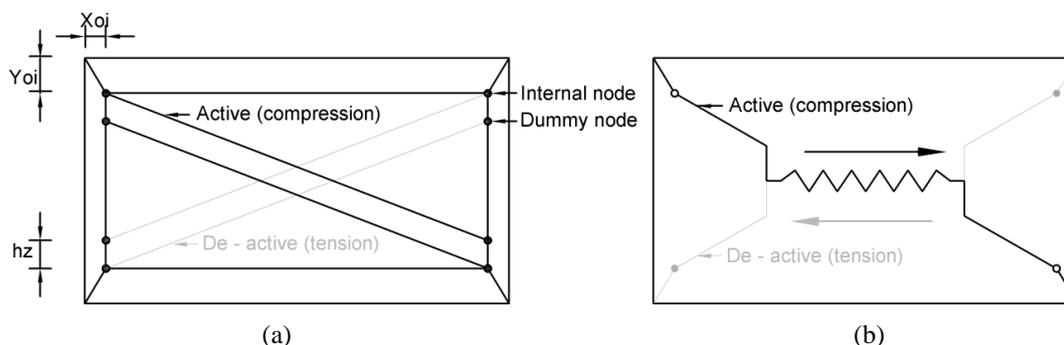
Infill panel element proposed by Crisafulli (1997) (a) Compression/tension struts, (b) Shear strut
